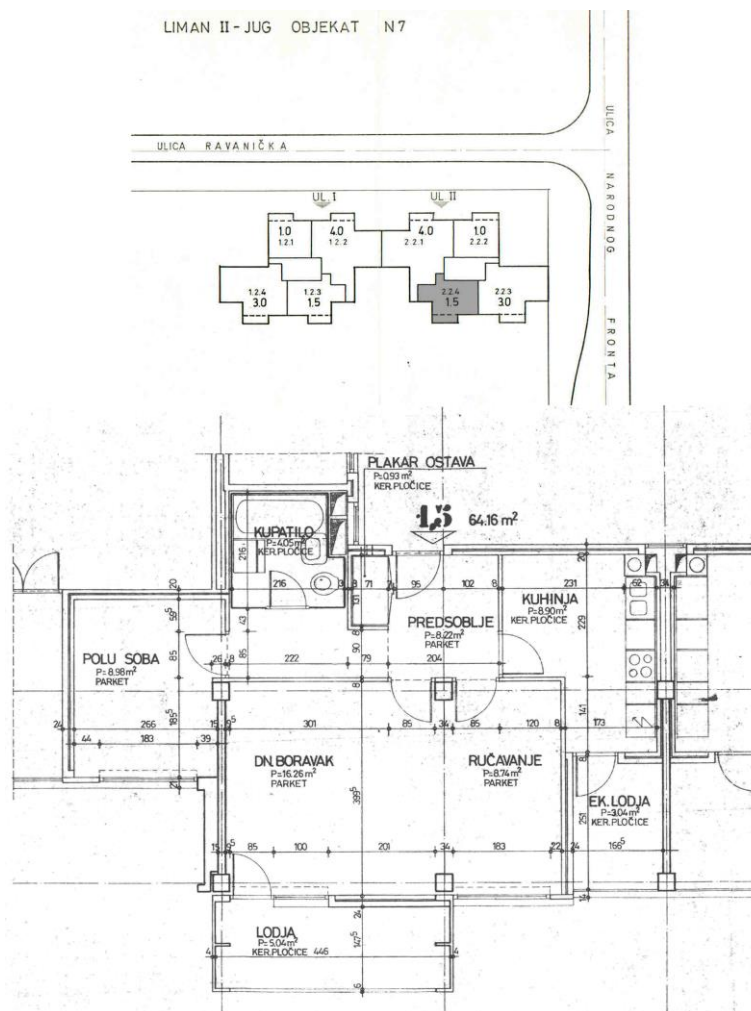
The original building scheme with the original floor plan of the analyzed dwelling
